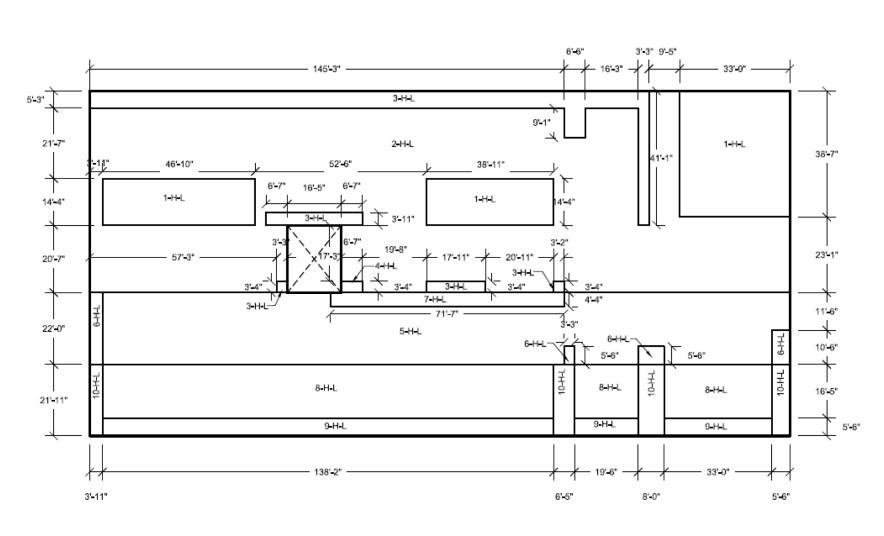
H.3-12 North Wall Looking South Transverse Reinforcement Zones
